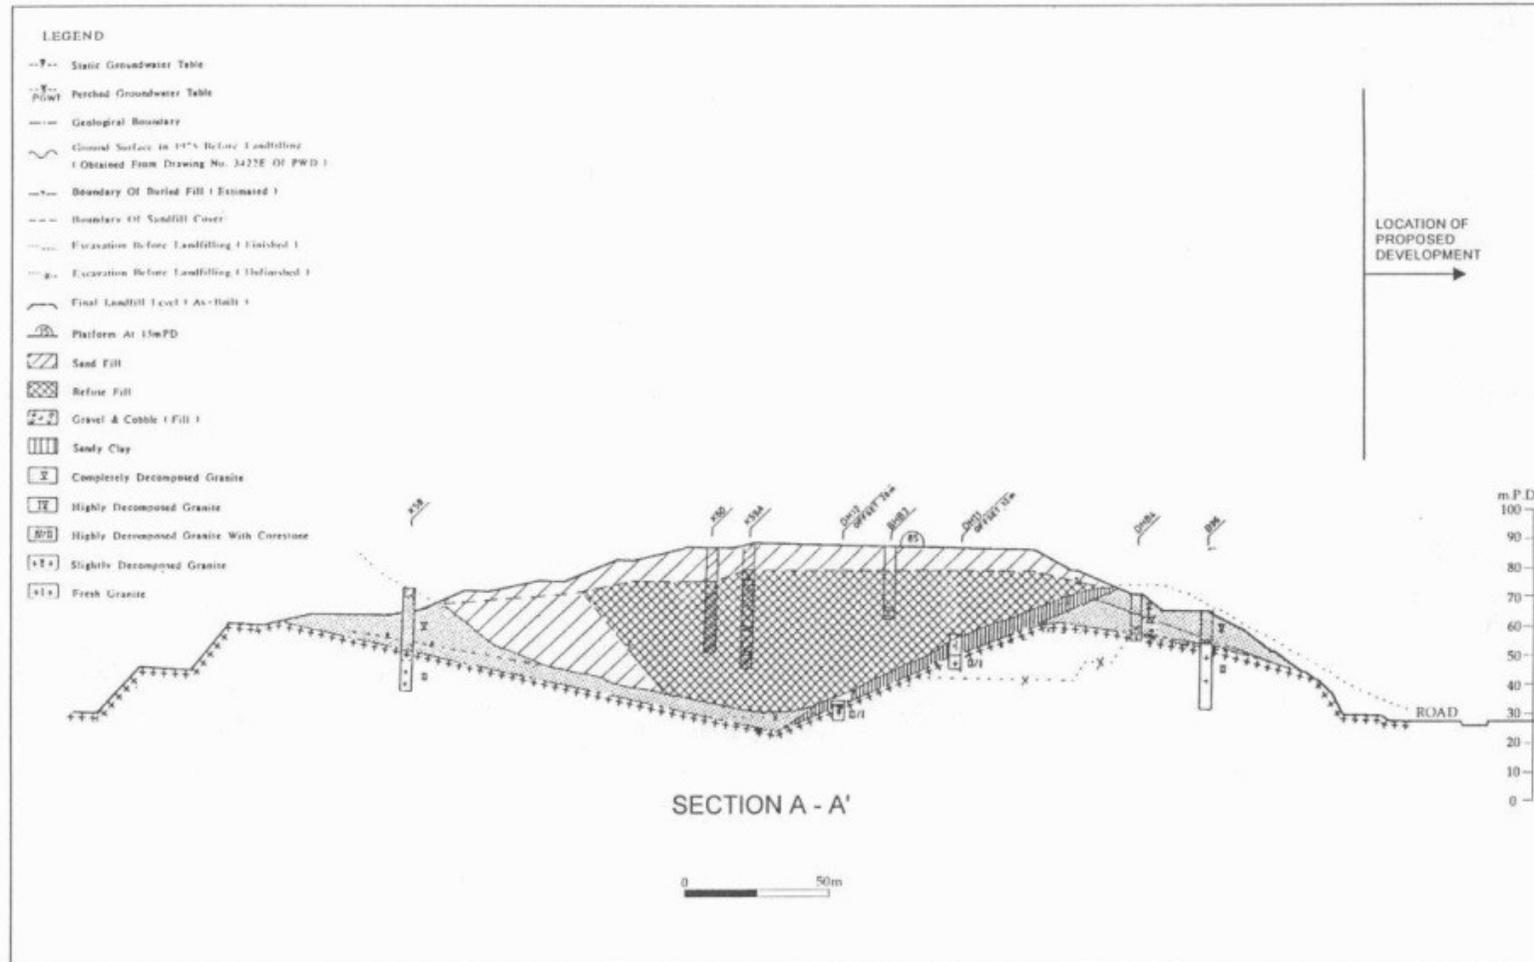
CROSS SECTION OF LANDFILL AND ADJOINING LAND
